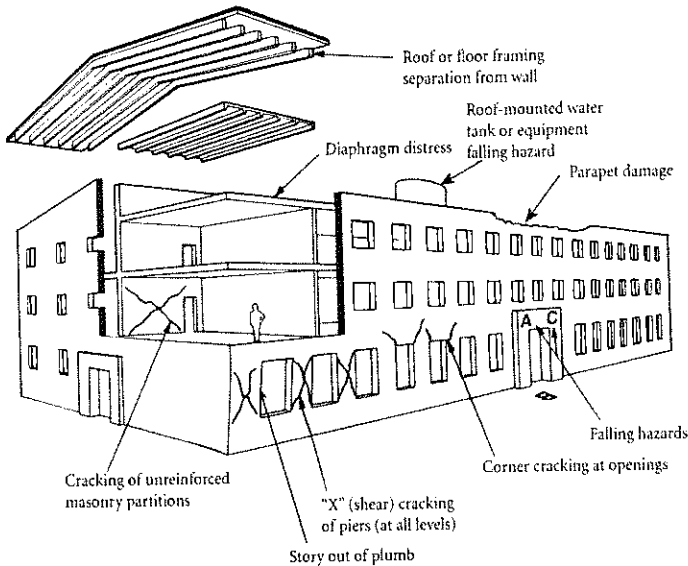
Inspection points for reinforced concrete shear wall buildings.
